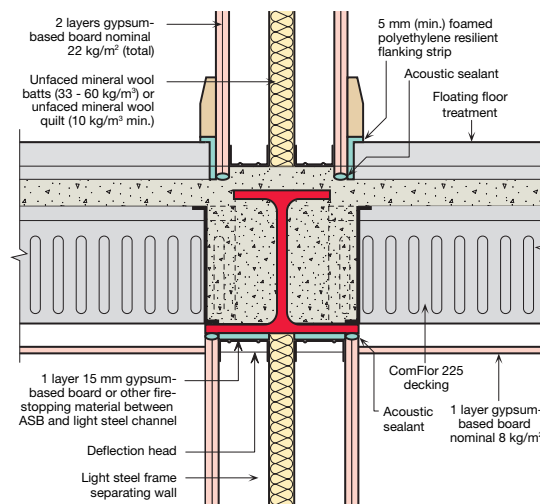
Acoustic detailing at junction between floor and separating wall with ASB
